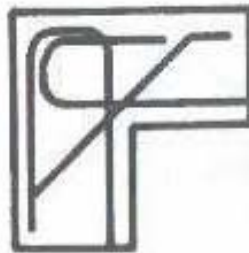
Satisfying reinforcement of opening corner joint [20].
